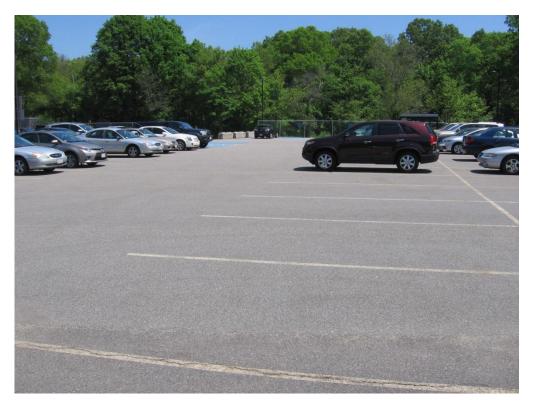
Commuter Parking Lot on Foxborough Portion of Site (Note minor crack in pavement in foreground along painted line)
